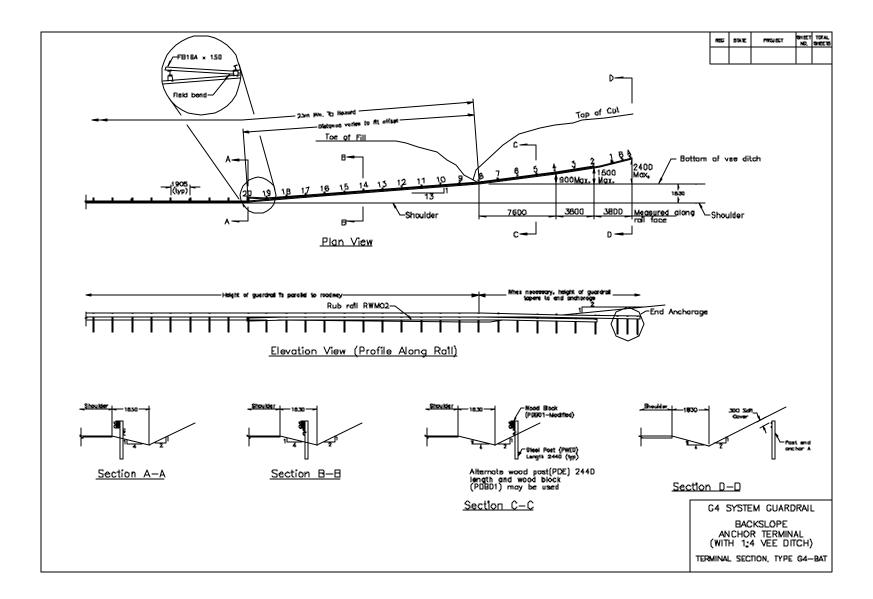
Details of the G4 W-beam guardrail buried-in-backslope installation for test 404211-13.
